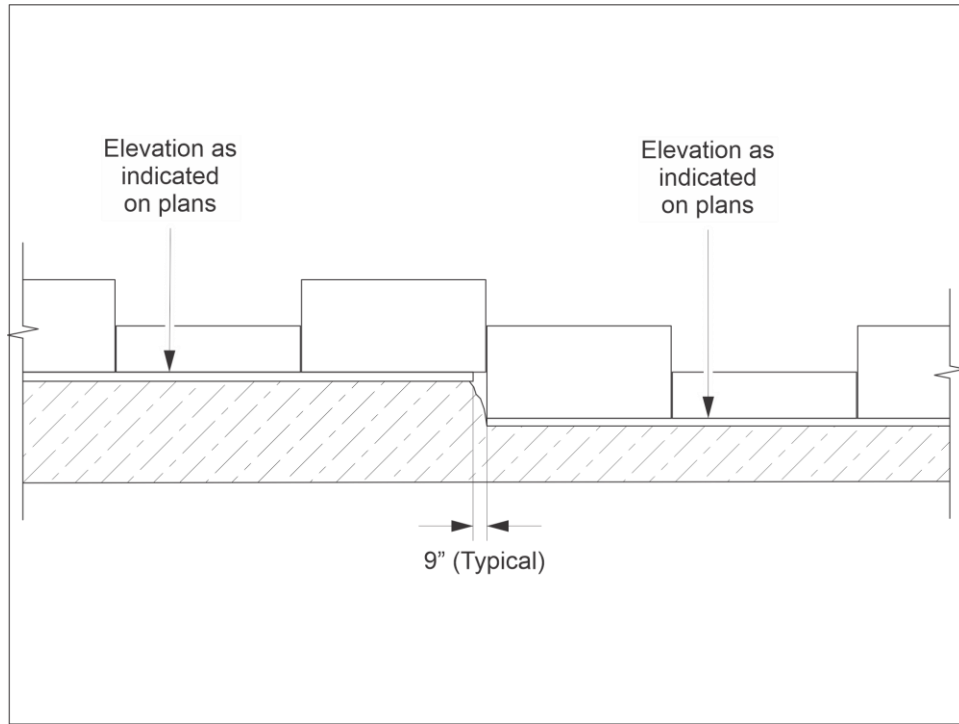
Example of how an MSE wall system vendor might recommend constructing leveling pads with step-ups
